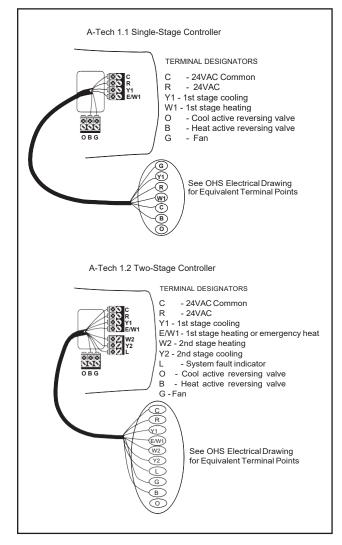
A-Tech 1.1 (top) and 1.2 (bottom) Controller Wiring Contacts
